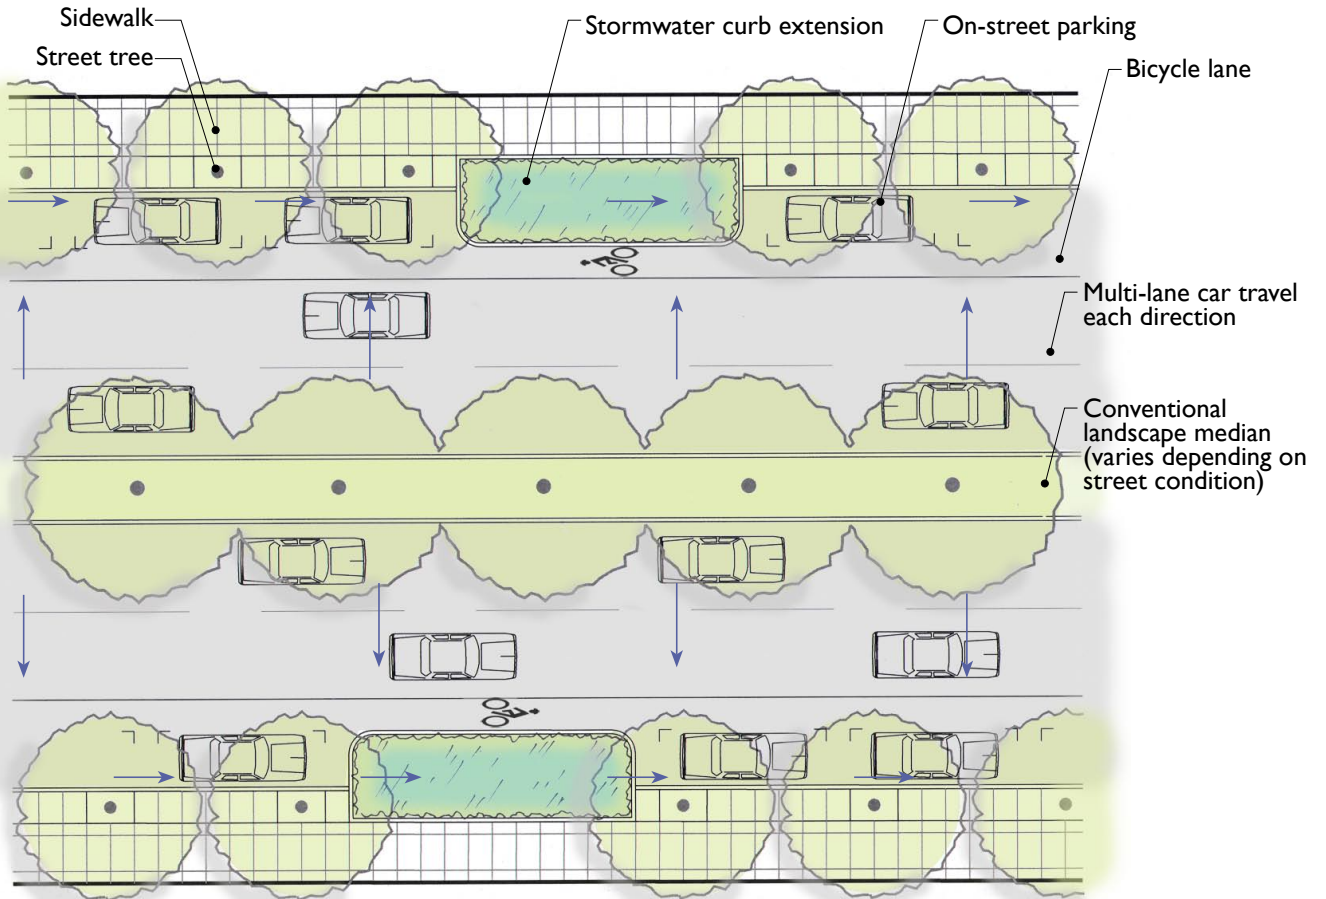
EXISTING: A typical multi-lane arterial street's sidewalk zone in San Mateo County.
